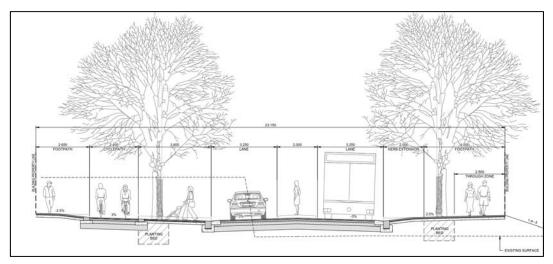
Typical cross section for the eastern section of the proposed Connector Road
